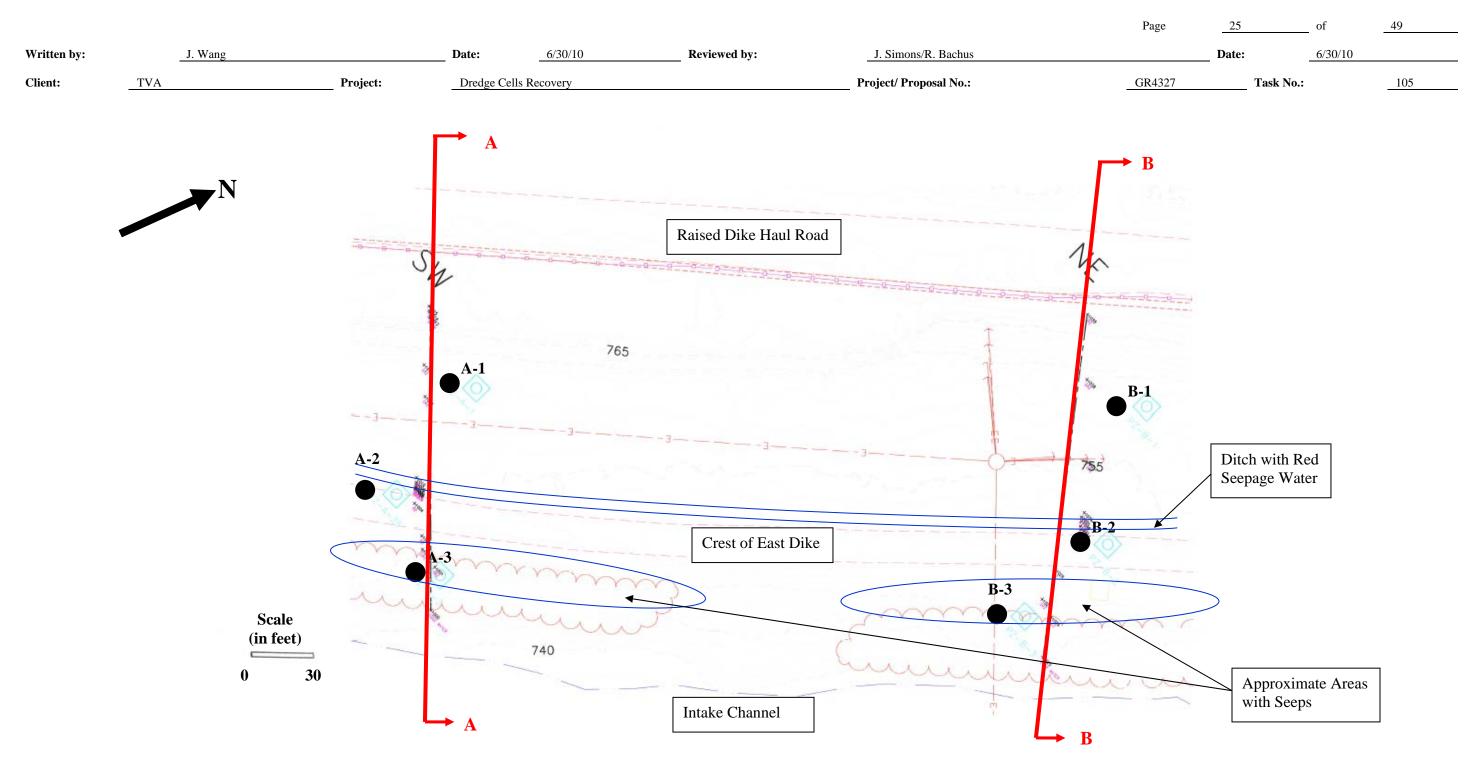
Boring and Cross Section Location Plan (Plan provided by Jacobs on 12 May 2010)
